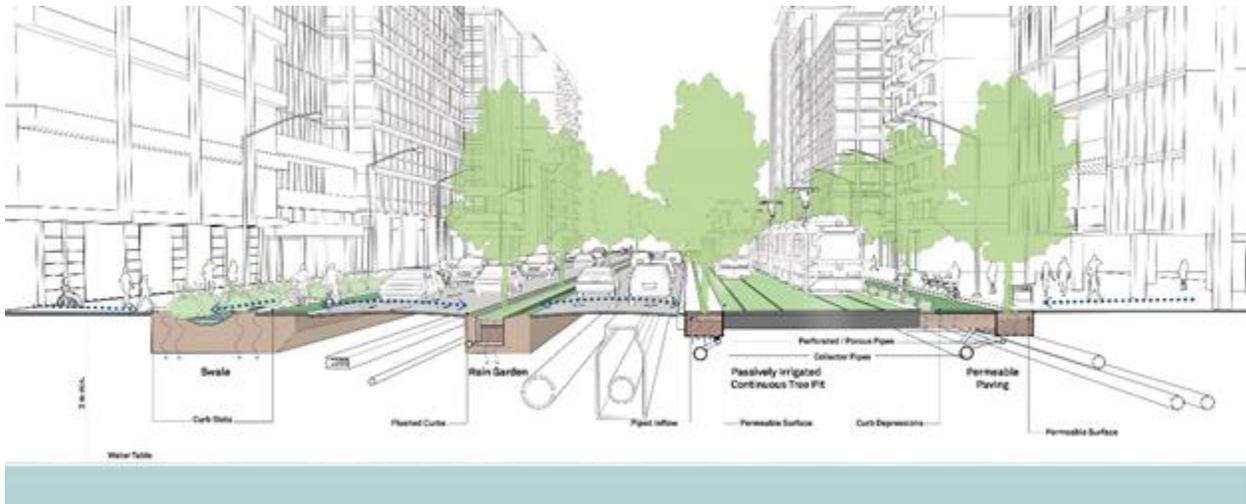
Permeable pavements and storage; *Global Designing Cities
